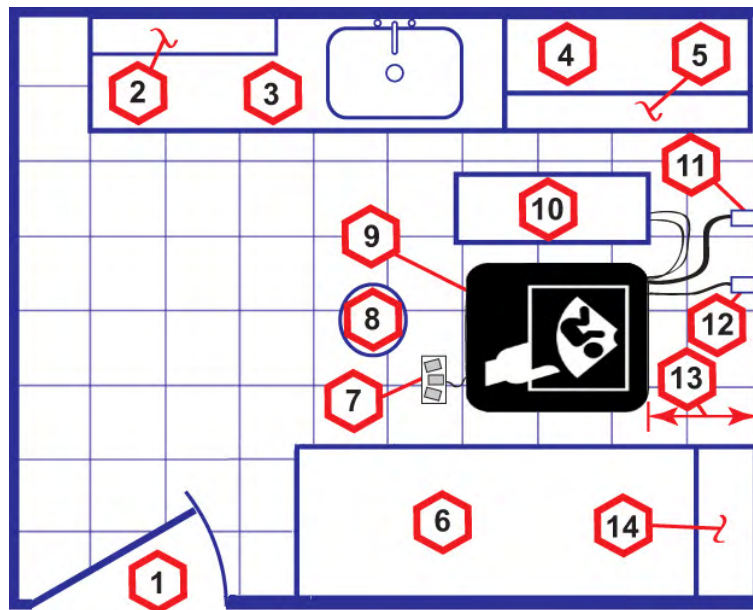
recommended Floor Plan 4.3 m x 5.2 m (14 by 17 foot)
